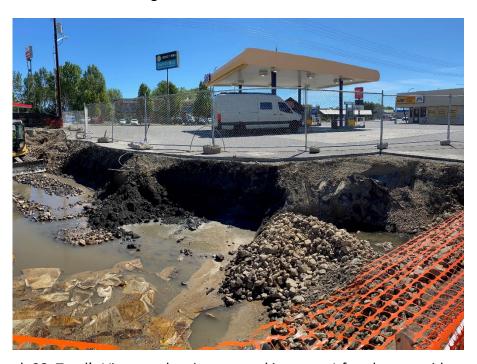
Overexcavation of LNAPL collection trench. View W.
